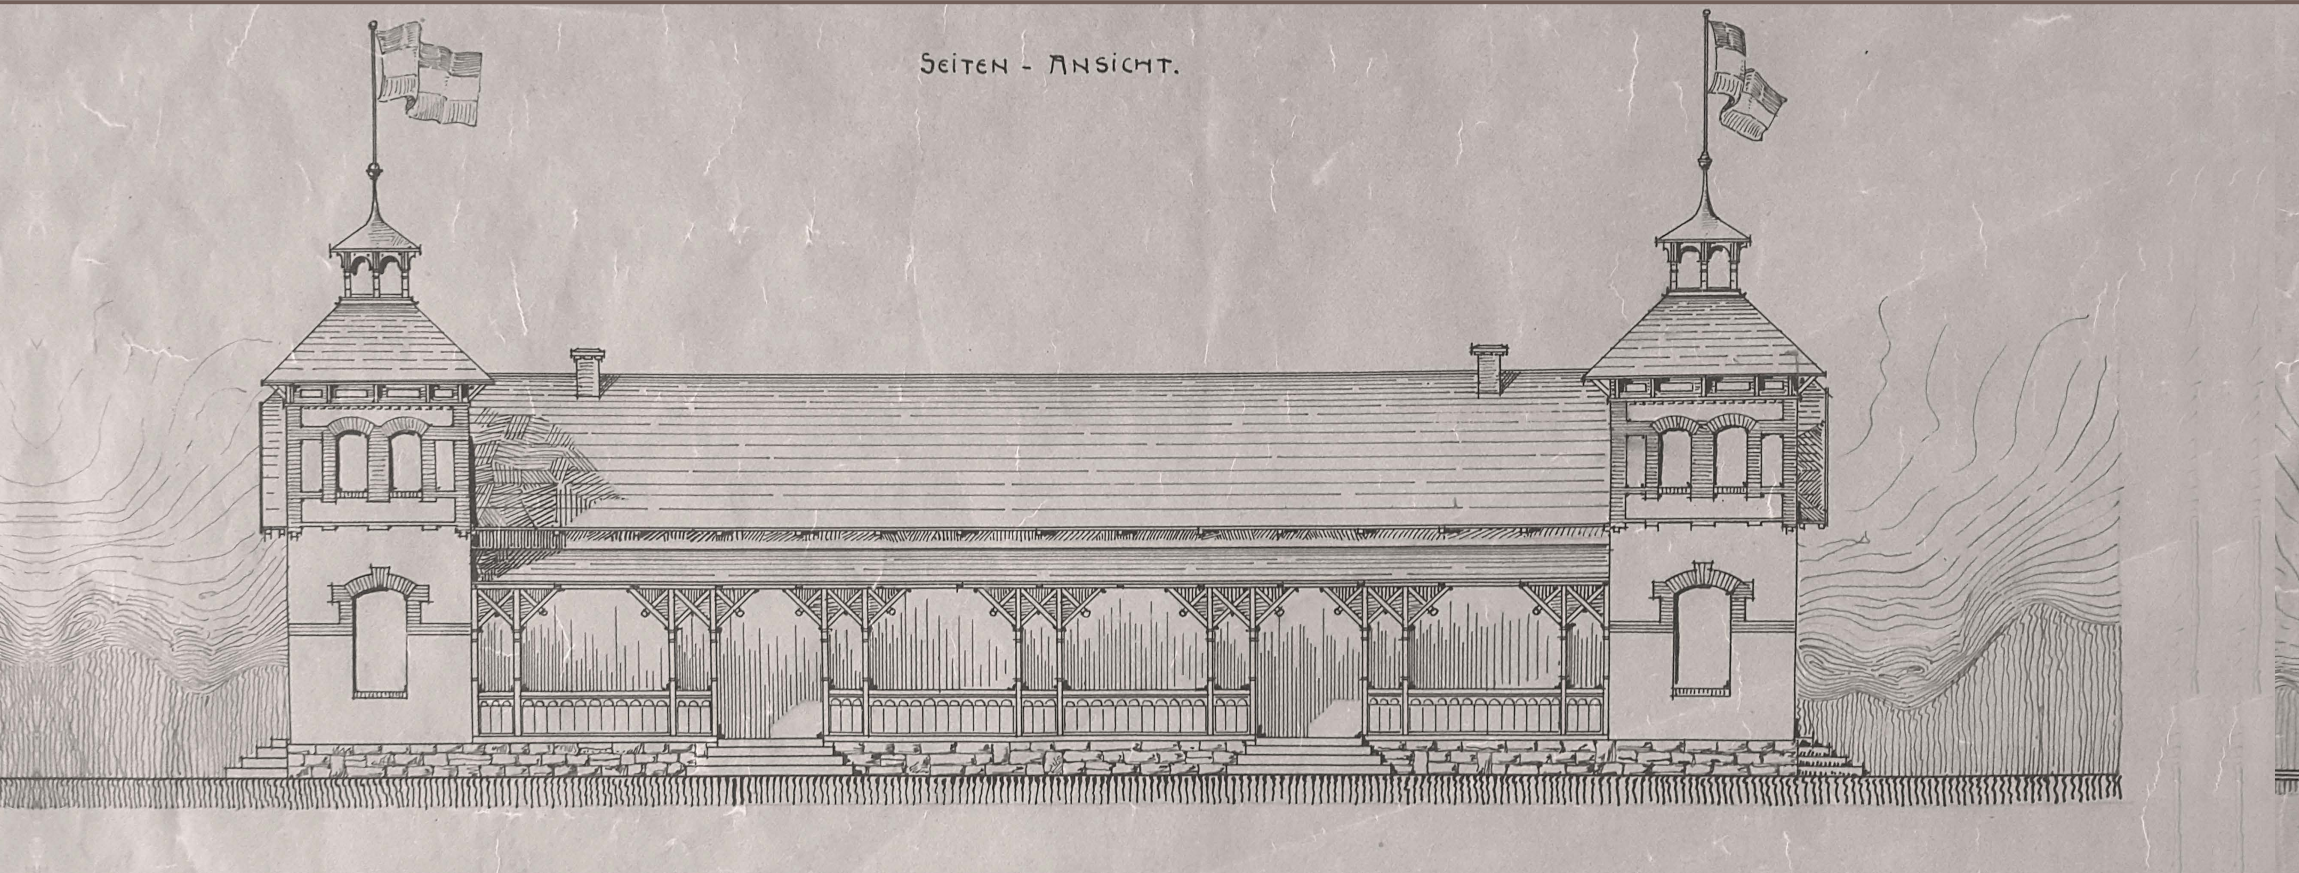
Photograph of Side Elevation of the 10-Mann-Haus drawn on bumph (tracing) paper possibly by architect Gottlieb Redecker in 1906. The elevation indicates the original design of the timber balustrades and the brickwork expressions on the towers that can still be seen today in a degraded state. The tracing paper is also indicative of the vulnerability of archived blueprints and original drawings.
